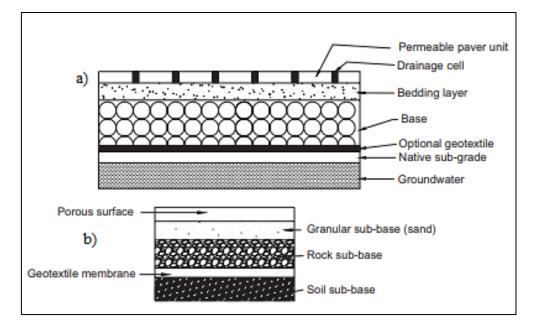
Typical schematic layout of a permeable pavement system (Source: Scholz & Grabowiecki, 2007).
